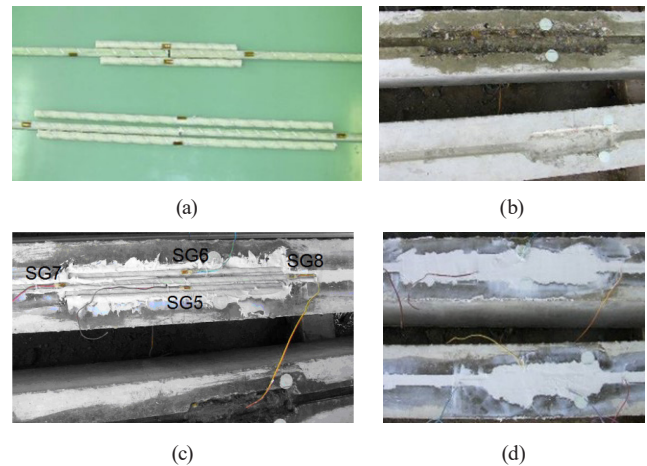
"Double strap joint" method: (a) supplement GFRP reinforcements, (b) groove, (c) installed supplement reinforcement with strain gages (SG5–SG8), (d) double strap joint filled with epoxy
